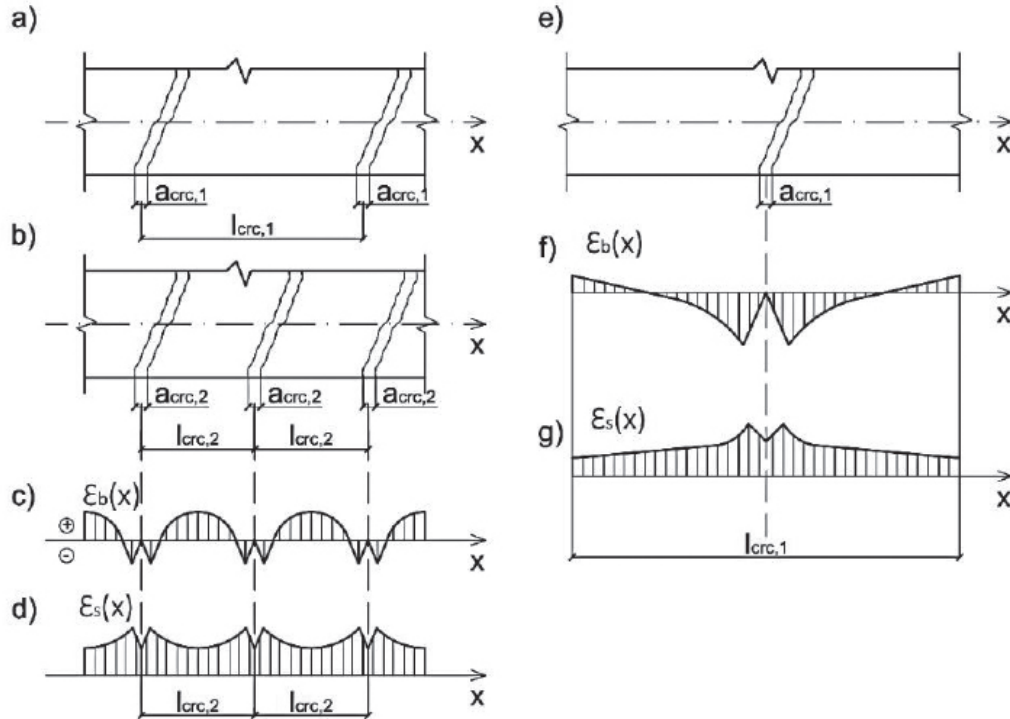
Level picture of cracking in a complexly stressed reinforced concrete element made of usual (a-d) and high-strength (e-g) reinforced concrete
